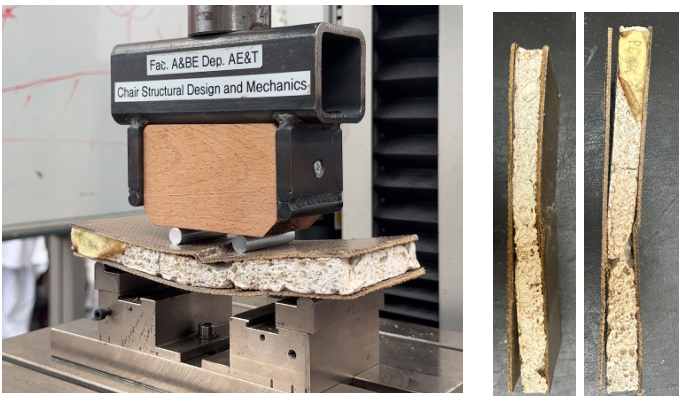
PLAX A3. Left, during testing. Right, after testing images
